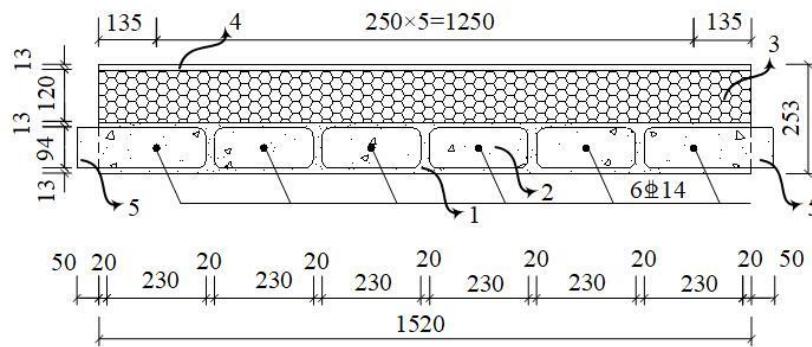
Plan view. Notes: 1. gypsum cavities; 2. concrete dense-column; 3. polystyrene insulation board; 4. gypsum protection board; 5. Loading position.
